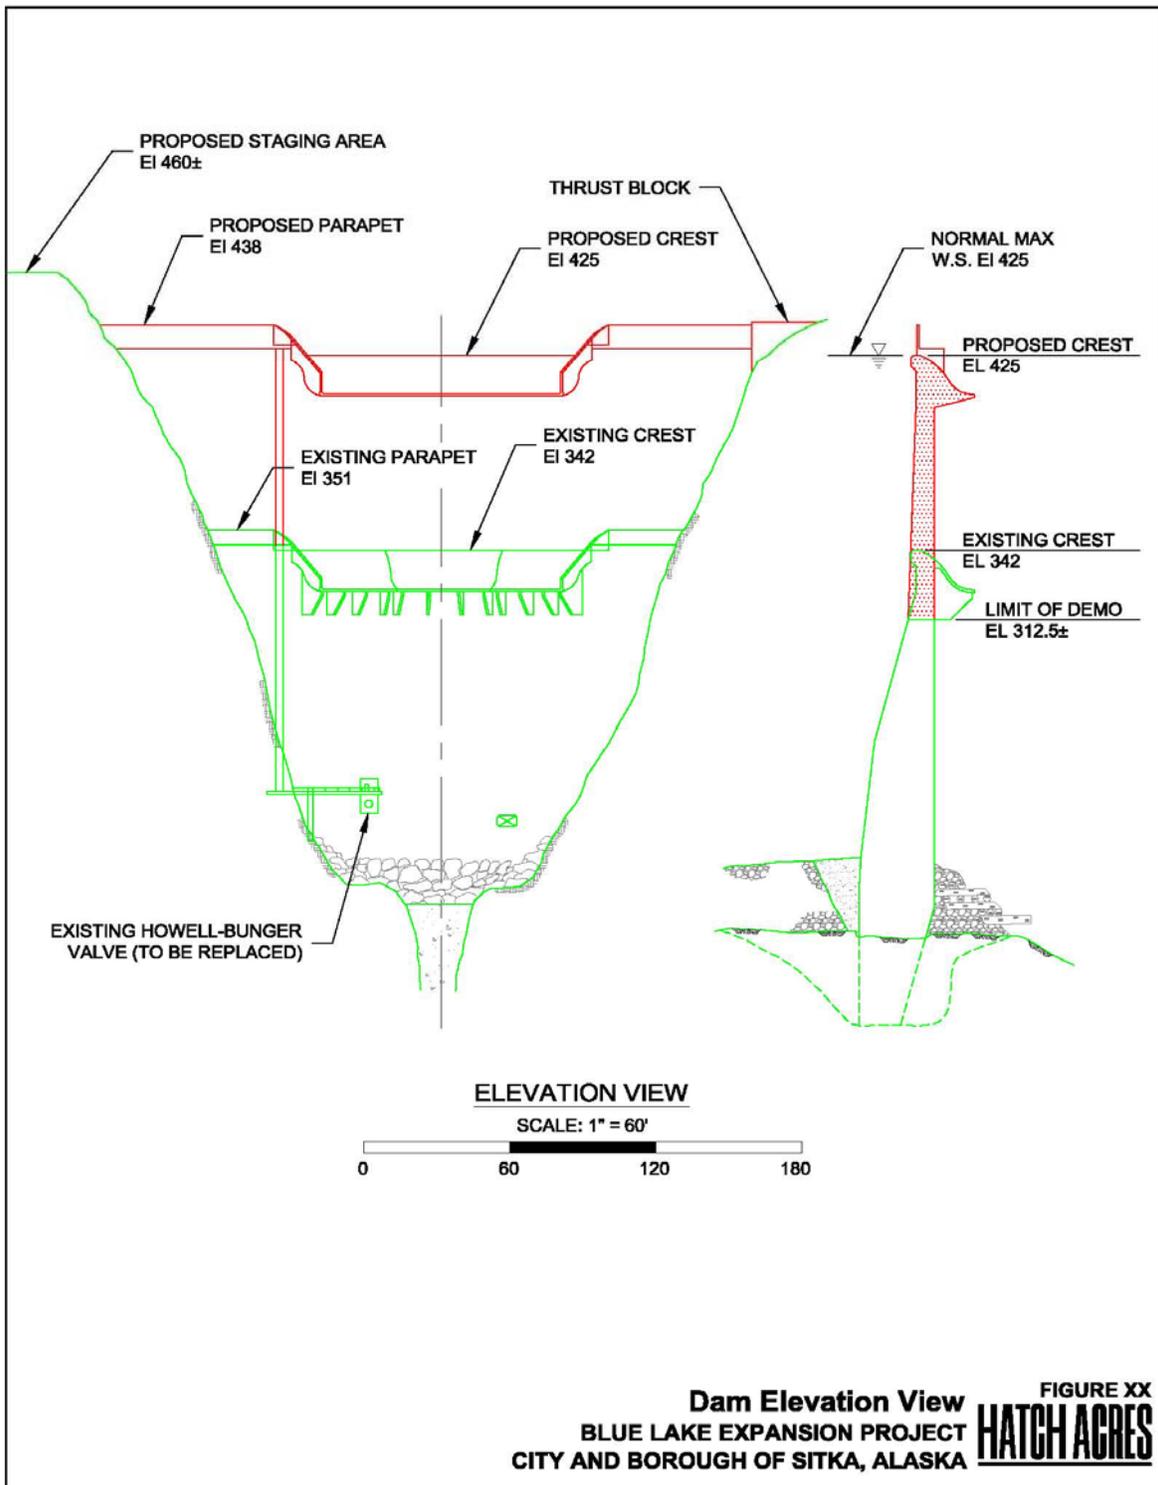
Elevation View of Existing and Expansion-Related Dam at El 425.
